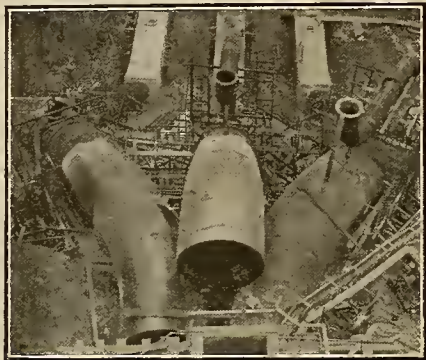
Looking down upon the three penstock pipes showing their triangular arrangement at the manifold site. The standpipe connections, two of which are complete, are shown also. The first 40 ft. of these pipes subsequently was encased in a solid concrete block.
